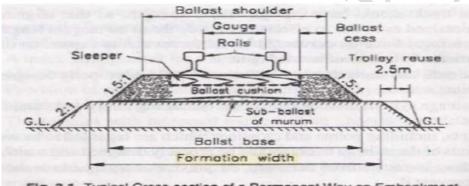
Typical Cross-section of a Permanent Way on Embankment.
